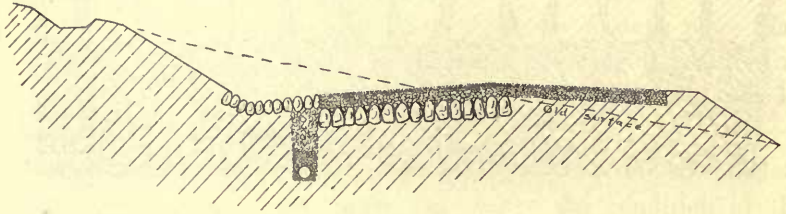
Section of road on sidehill with side-drain and telford foundation on up-hill side.
